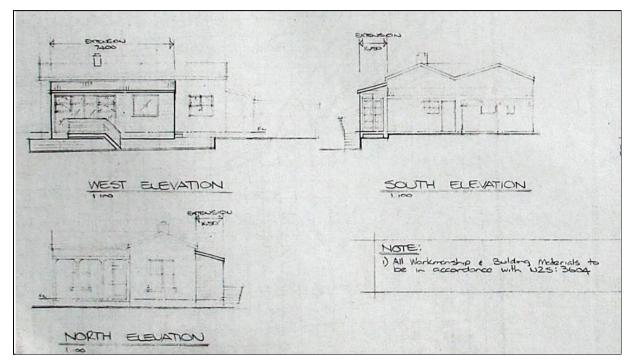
Elevation drawings of Smalls Cottage, including the additions on the west elevation. Drawings made in 1986.
